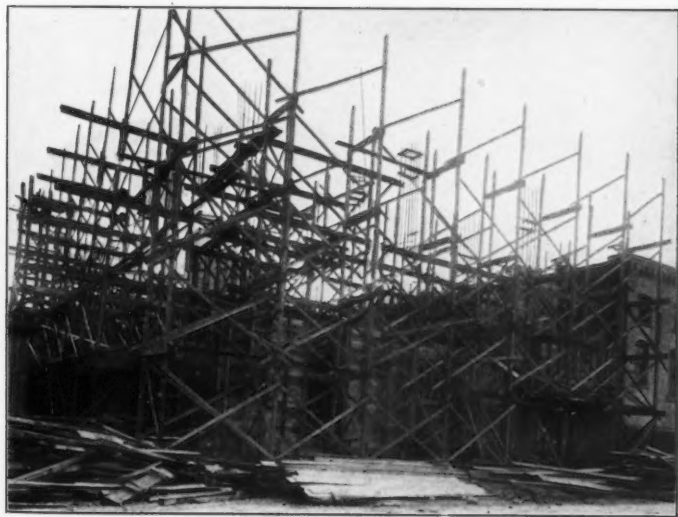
SCAFFOLDING TO SUPPORT REINFORCING RODS.
